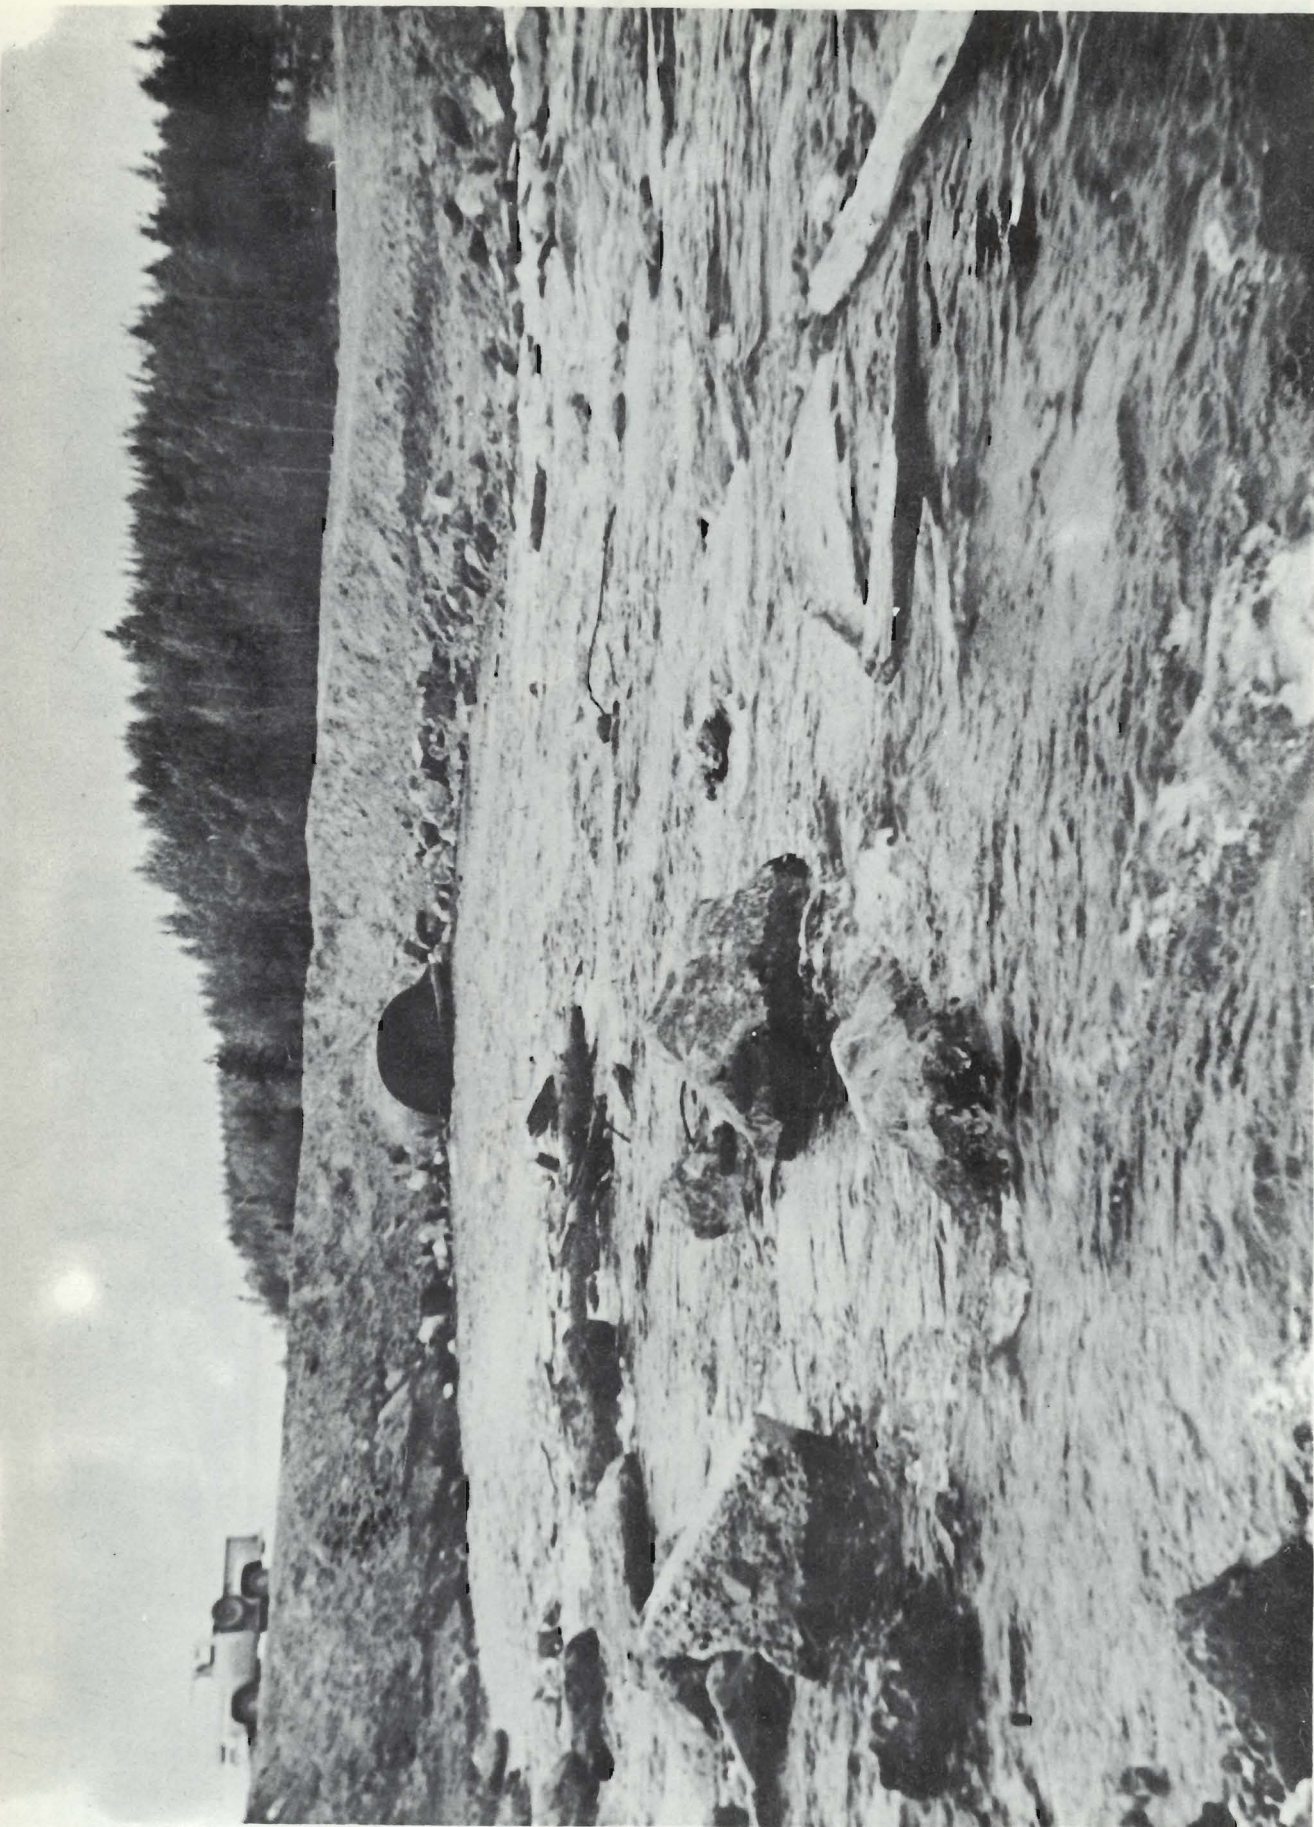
Downstream View of Campbell Creek Reservoir Outlet.
